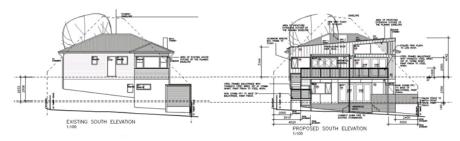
South (rear) elevation (Steven Spizick Architect, 2021)
